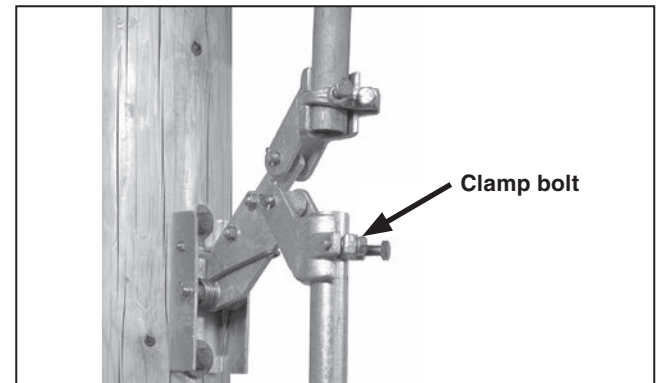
Torquing the clamp bolt at the lowest rod guide (or interphase drive lever) coupling.
